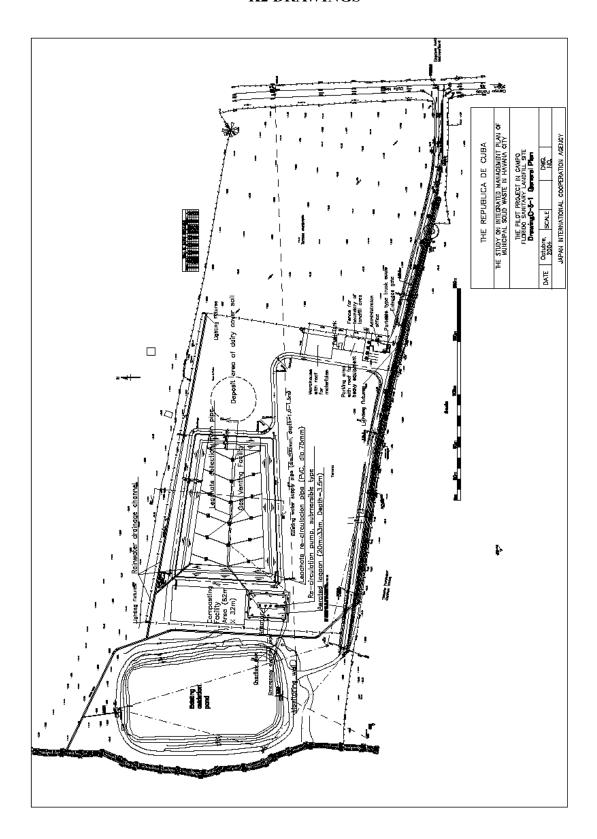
General Plan of Pilot Project in Campo Florido Landfill Site
